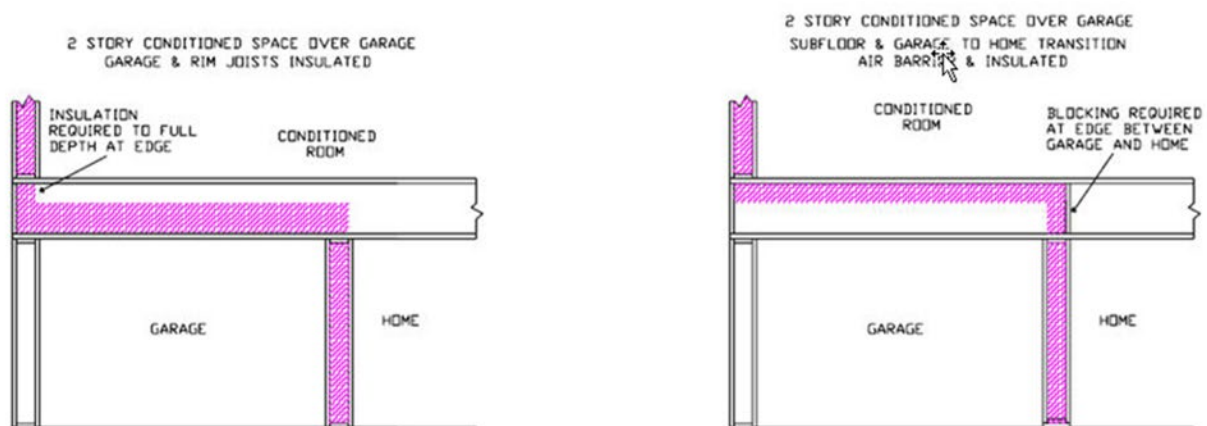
Homes with Conditioned Space Over Garage – Structural Insulated Panel (SIP)
